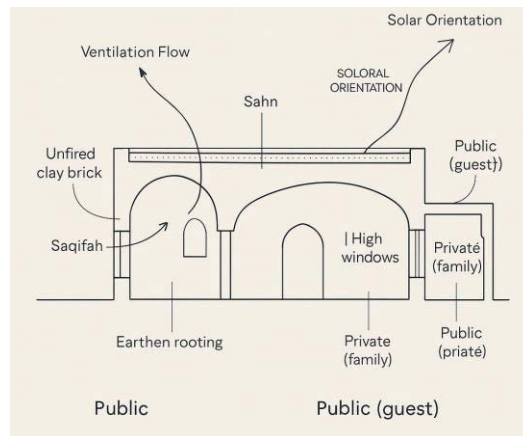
Proposed Conceptual Model : cross section showing the spatial hierarchy
